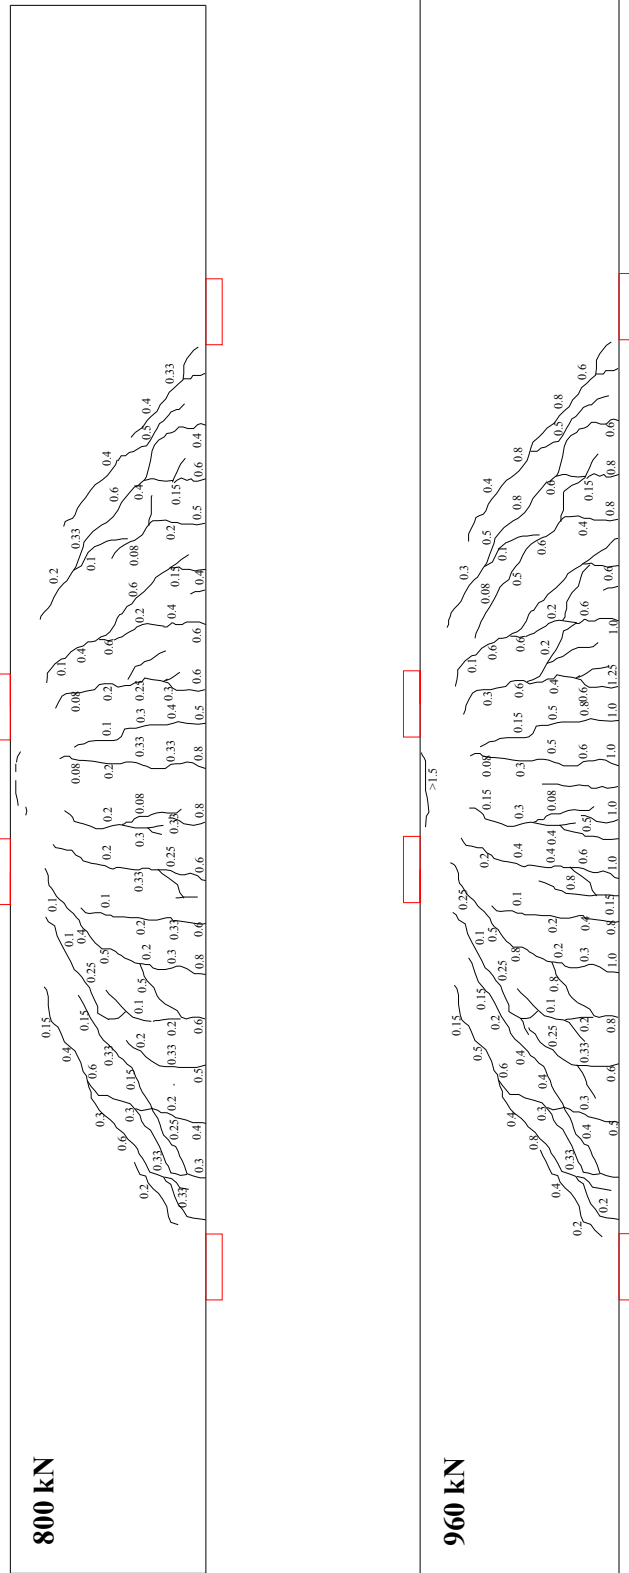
Crack patterns at 800 kN and 960 kN of loading at test of specimen MS3-2
